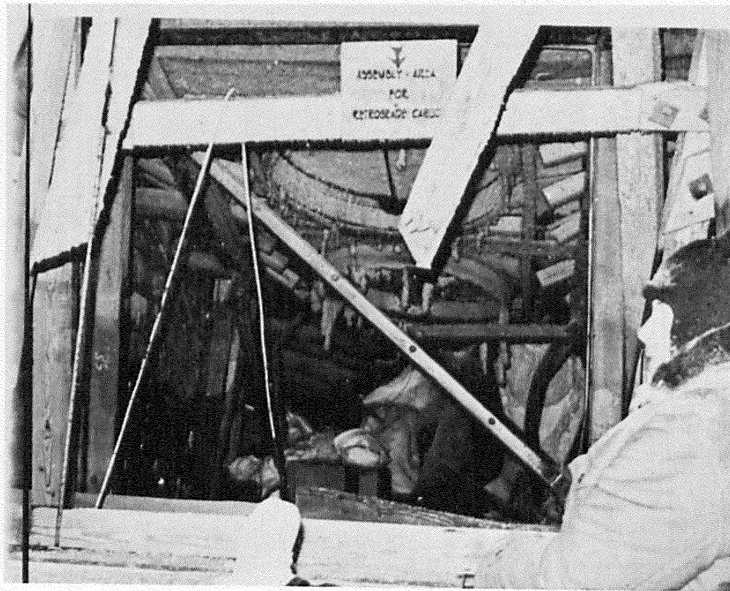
Crushing of wood and steel reactor building in Trench 3.
